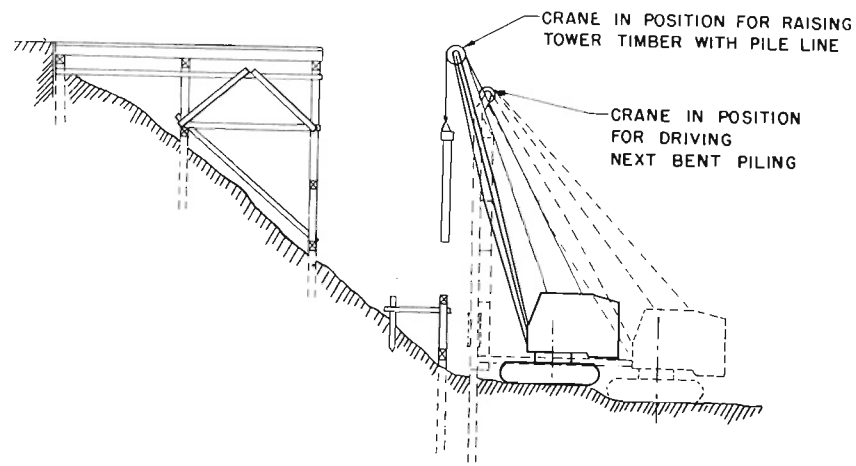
Crawler-mounted crane operating from ground to drive piles and erect timber towers.
